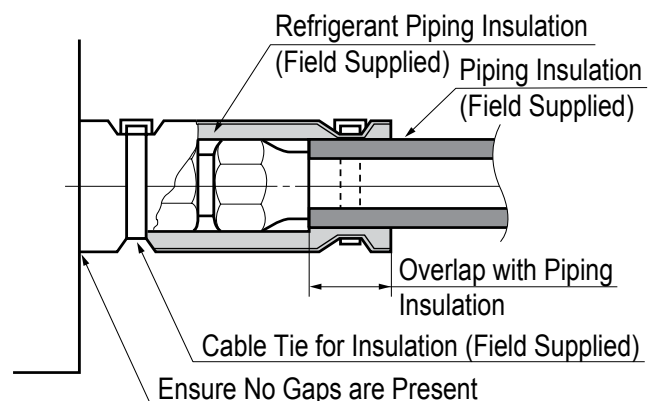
Typical Refrigerant Line Flare Fitting Insulation Detail.
